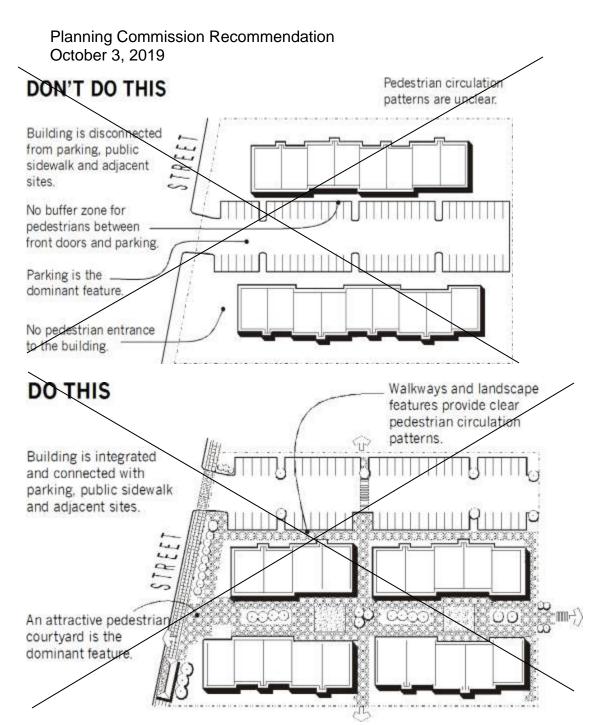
(D): Avoid parking that dominates the site. Encourage parking located behind or on the side of buildings and common open space between buildings.
